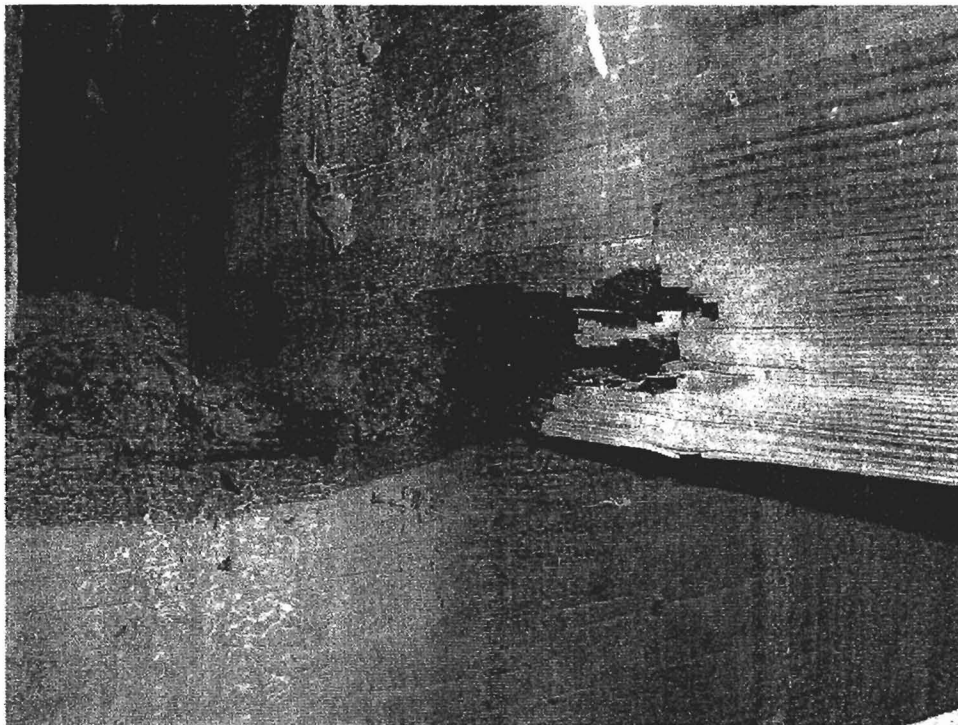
Stringer 5 in Span 2 at Bent 1.
